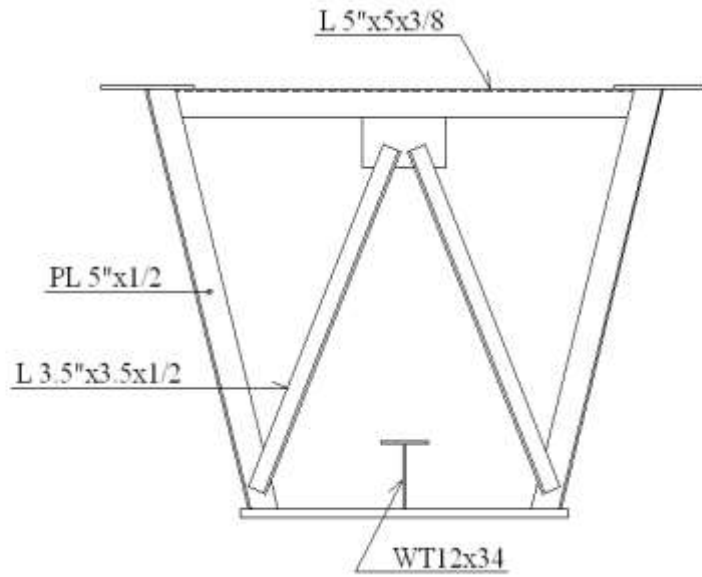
Cross-section of the Ft. Lauderdale bridge 860600.
